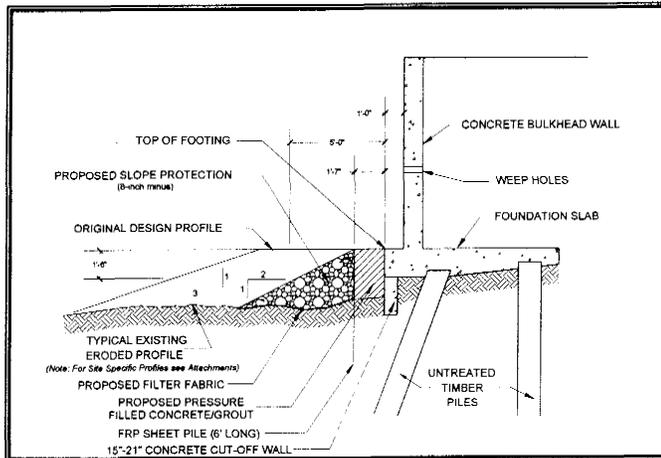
Bulkhead Repair Detail Showing Sheet Piling Installation
